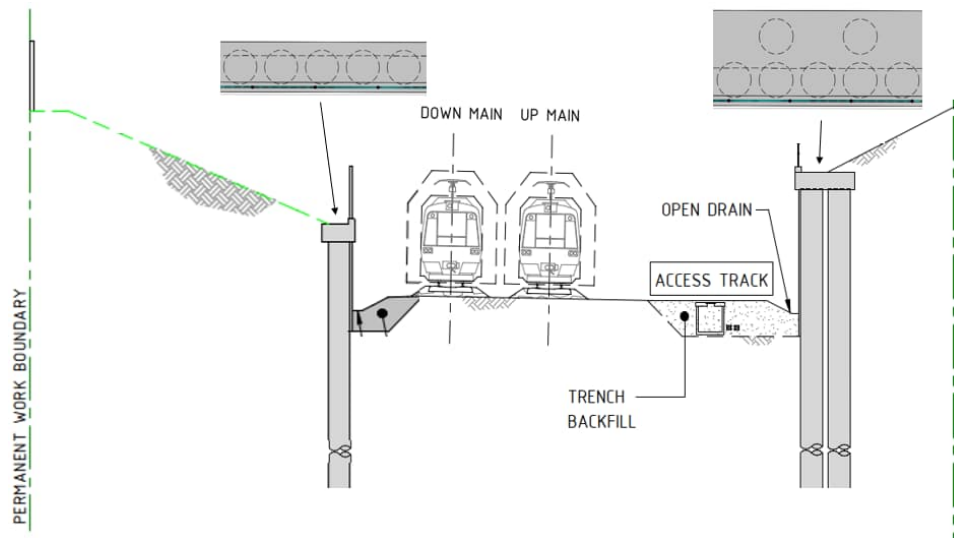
Typical section through piled walls showing single pile row (left) and double row arrangement (right).
